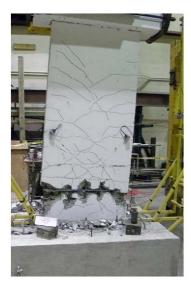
Condition of Wall W2-NR prior to failure (Abdulridha [1])
